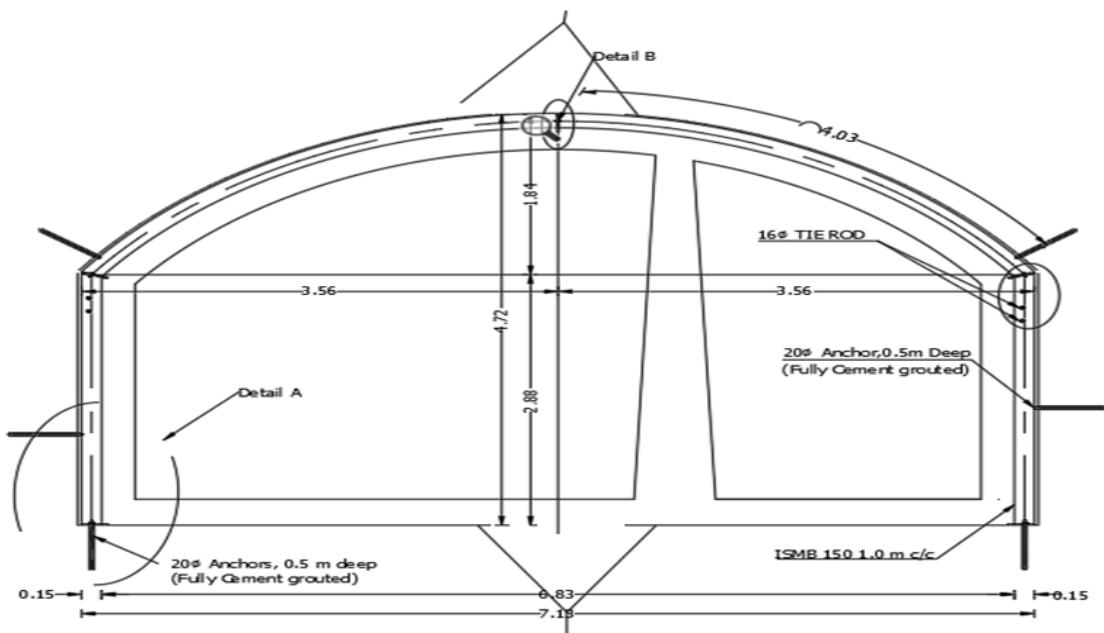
Section of Concrete Lining Between Ribs (Rock Type-V)
